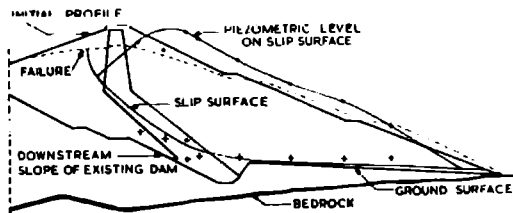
Model of Proposed Raising of an existing embankment (model length 1.7m, scale 1:100)
